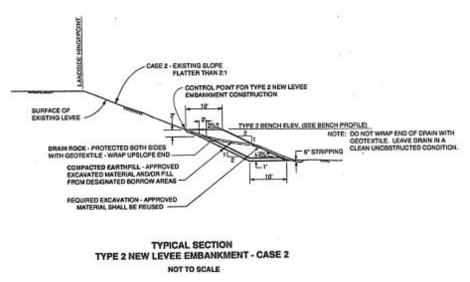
Sacramento River Levee - Typical Stability Berm Section
